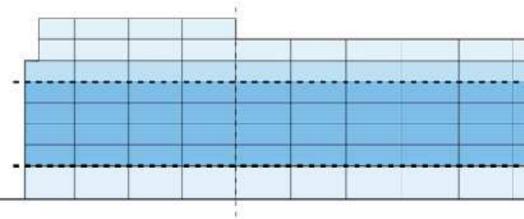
Plot B1A Elevation - frontage proportion and subdivision
